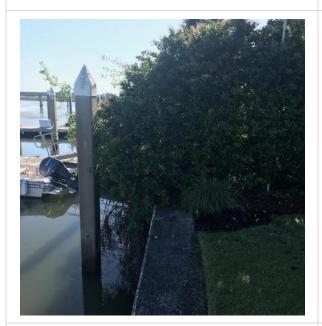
Trees and shrubs have been planted very near to back side of the wall. The wall cap has completely been covered by overgrown shrubs and trees, Stations 30+70 to 33+00, typical
